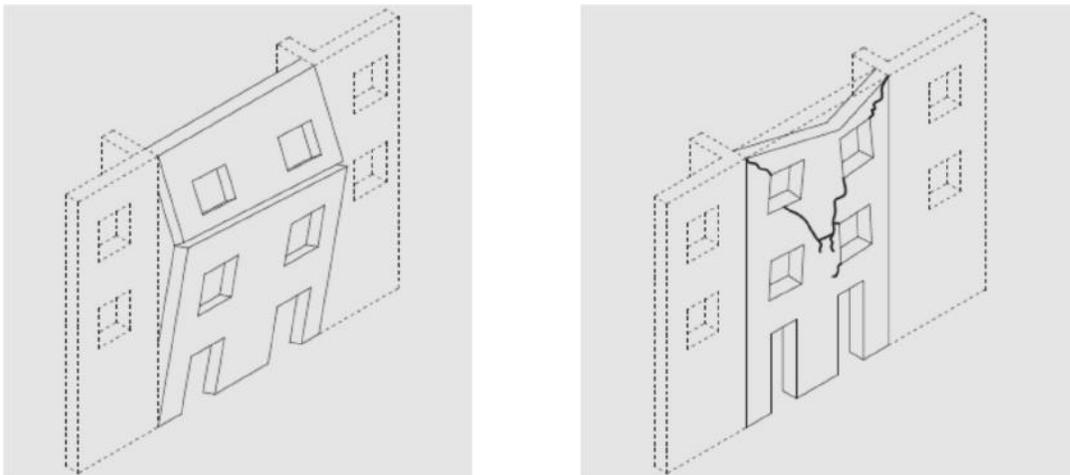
Out-of-plane collapse mechanisms for unreinforced masonry walls (D'Ayalla and Speranza, 2003).
